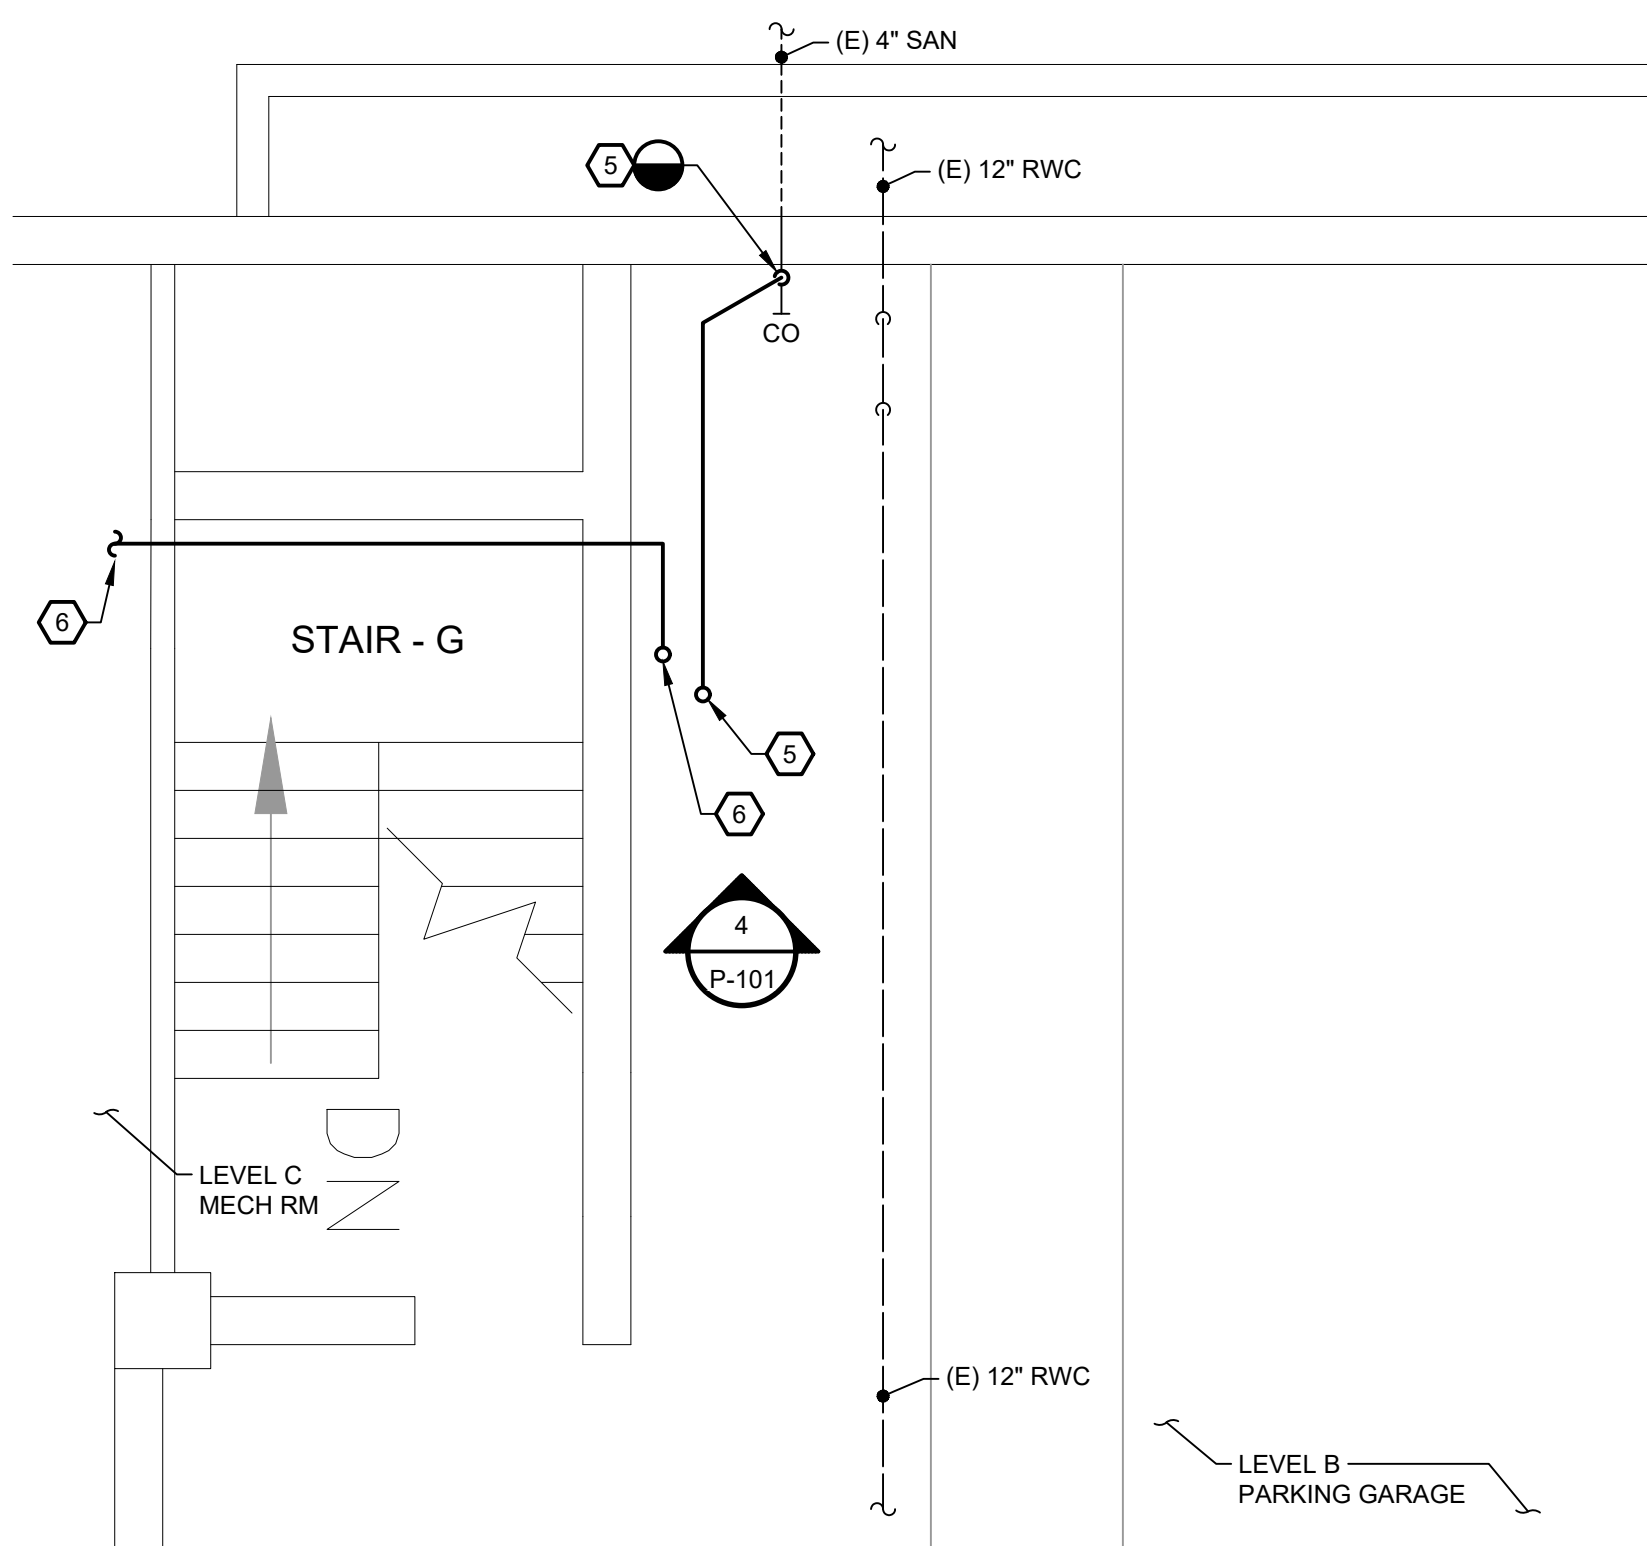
DETAIL - COURTHOUSE WASTE WATER BASIN & PUMP SP-2
